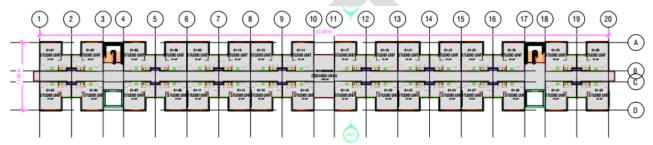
Affordable Unit Typology - Alternative Linear Floor Plan, Studio Block
